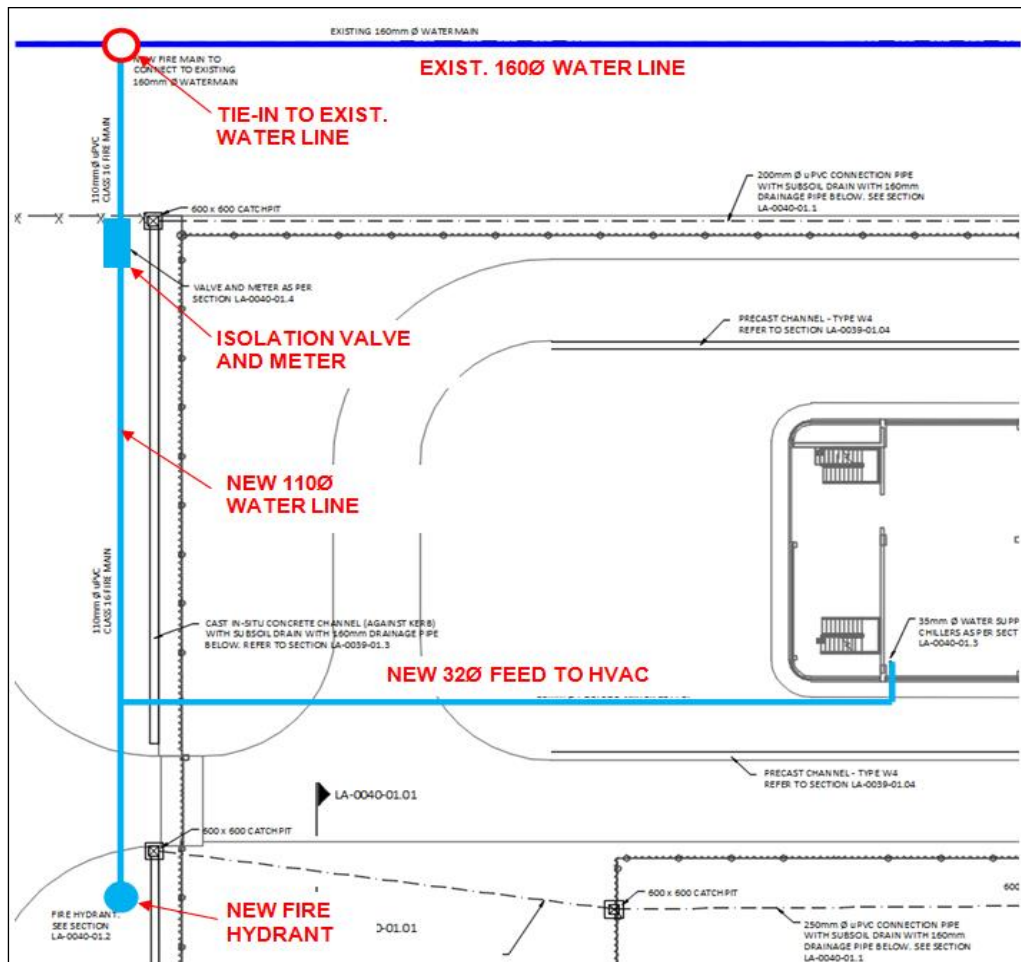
Fire Hydrant and HVAC Water Feed Connection
